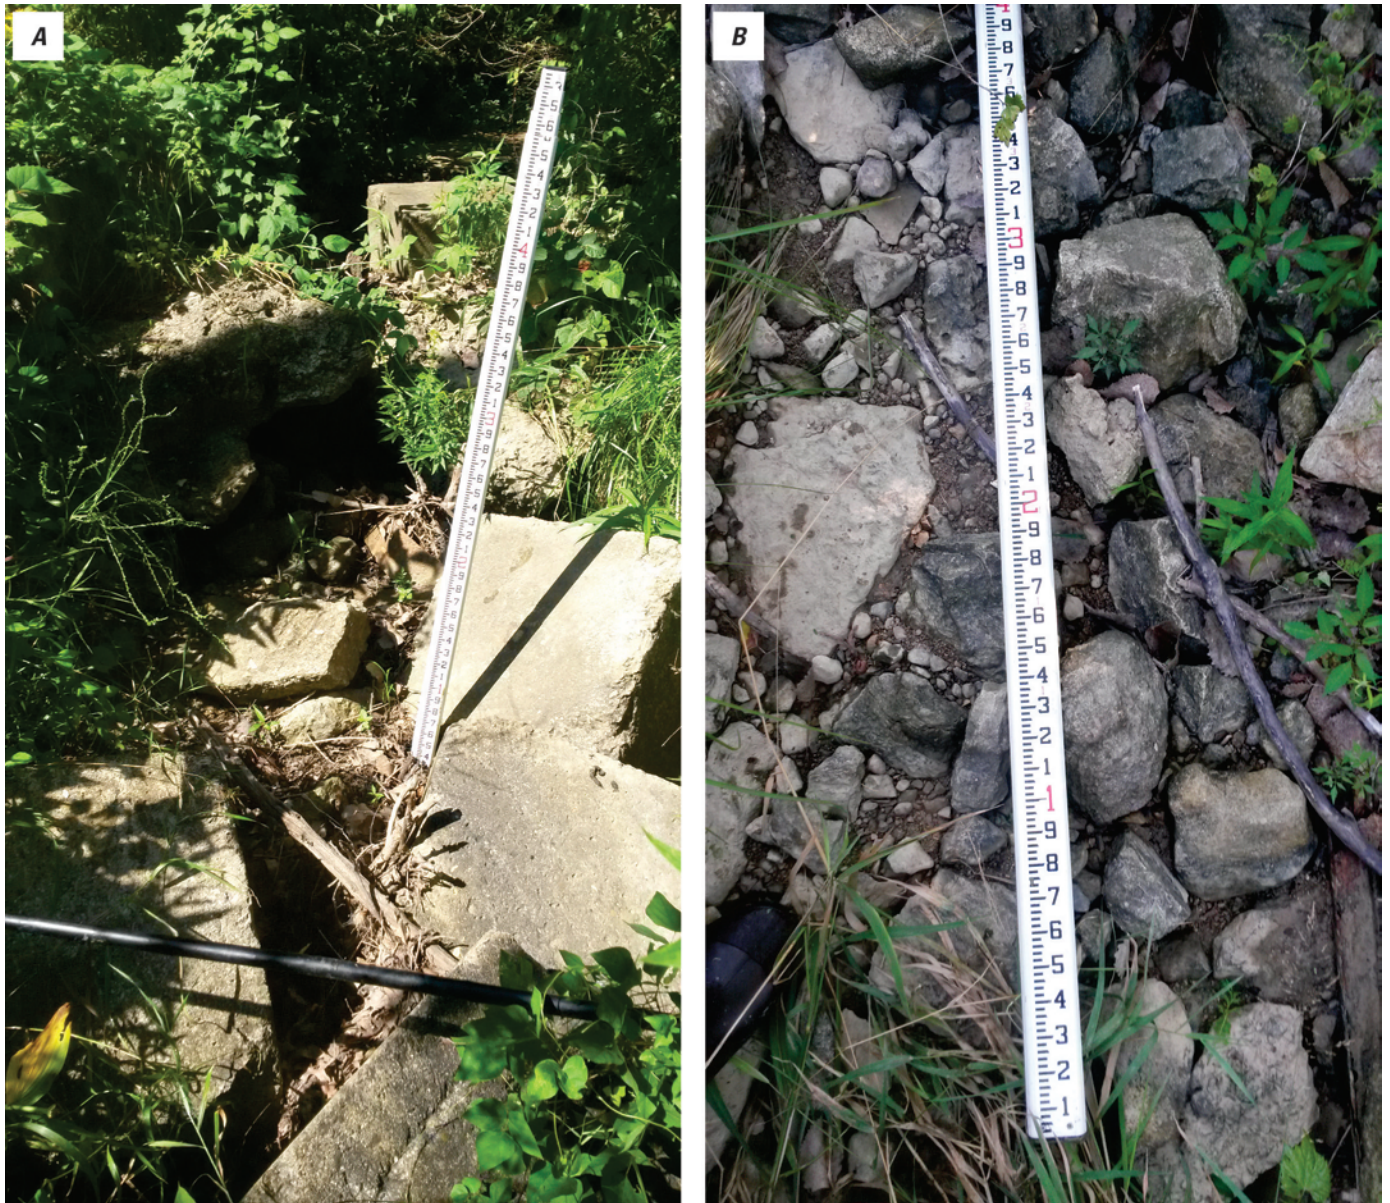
Concrete and rock that has been placed in the Southeast Drainage Way to *A*, help mitigate the nickpoint migration at WP04 near station 1473 and *B*, protect utilities at WP02 near station 1190, Argonne National Laboratory, DuPage County, Illinois.
